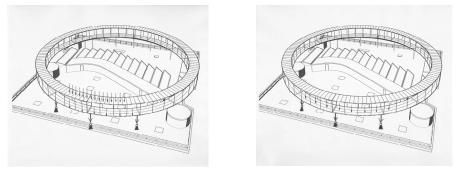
Transfer of vertical loads on the roof and dead loads from the glass walls; left: dead loads, snow loads and wind loads on the roof; right: live loads on the floor surface of the box girder.
